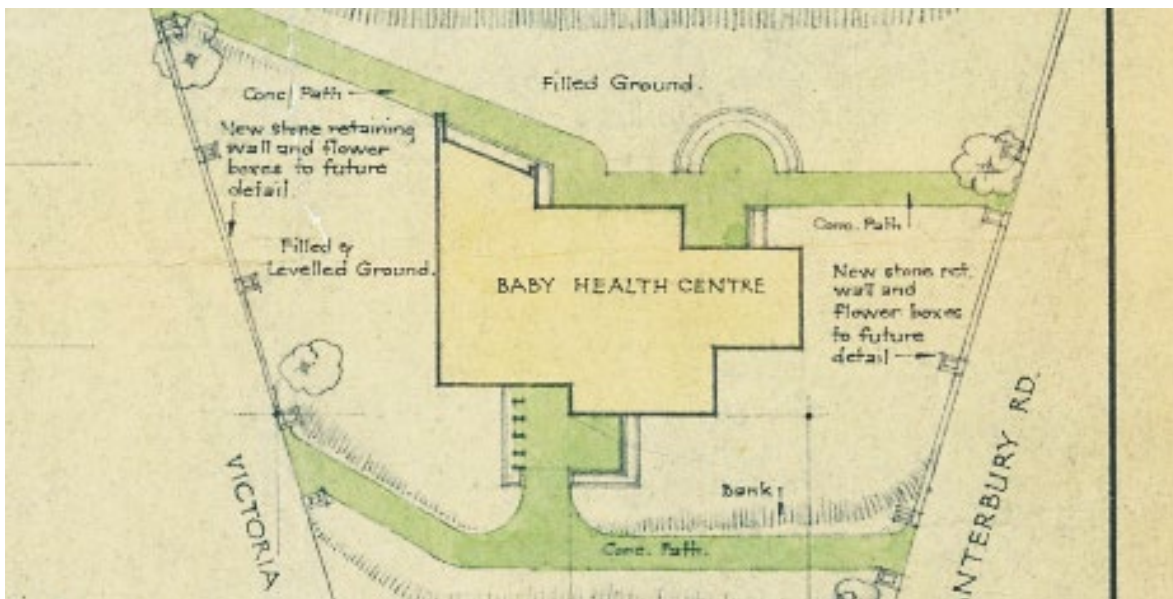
Detail of site plan for A Baby Health Centre (BA 229/49) showing semi-circular component of concrete path.
